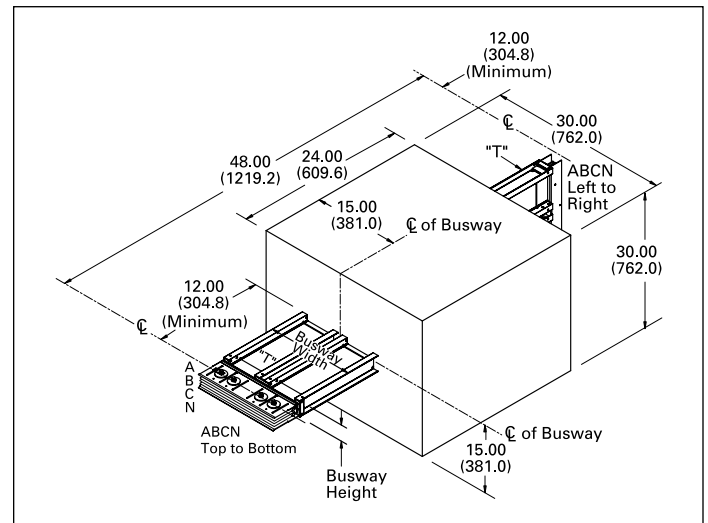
90° Transposition—Dimensions in Inches (mm)
